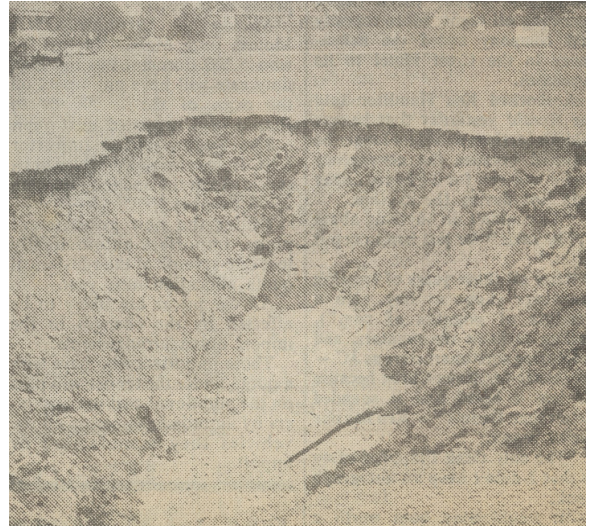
A burst stormwater pipe causing a mudslide at Scots College (source - SMH, 10/11/1989)
